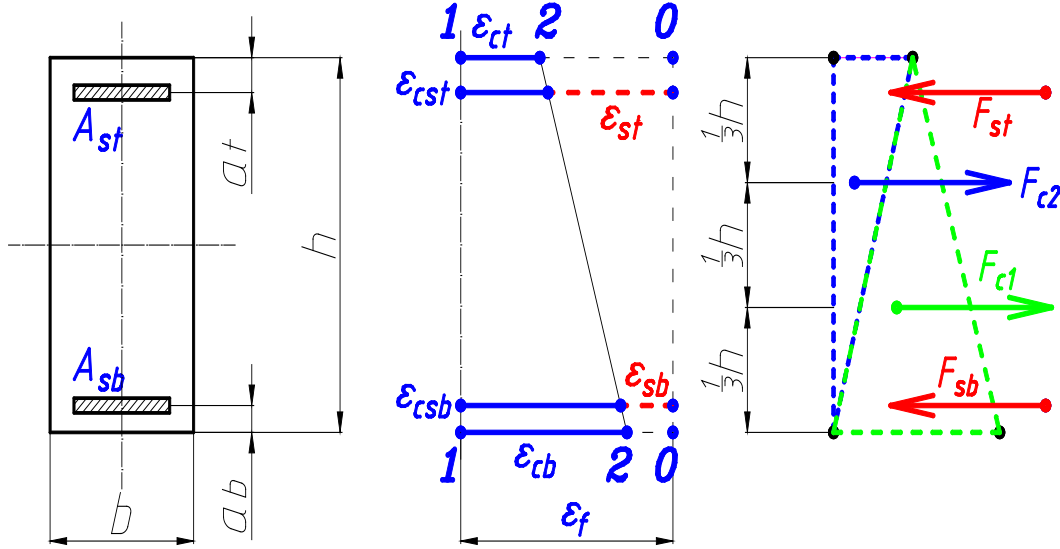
The section under analysis, deformations of cross section, forces due to strain.
